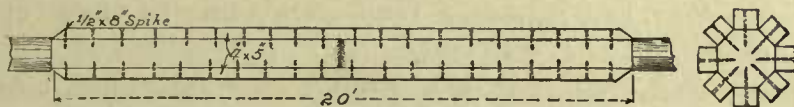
PILE-SPLICE, POUGHKEEPSIE BRIDGE.
